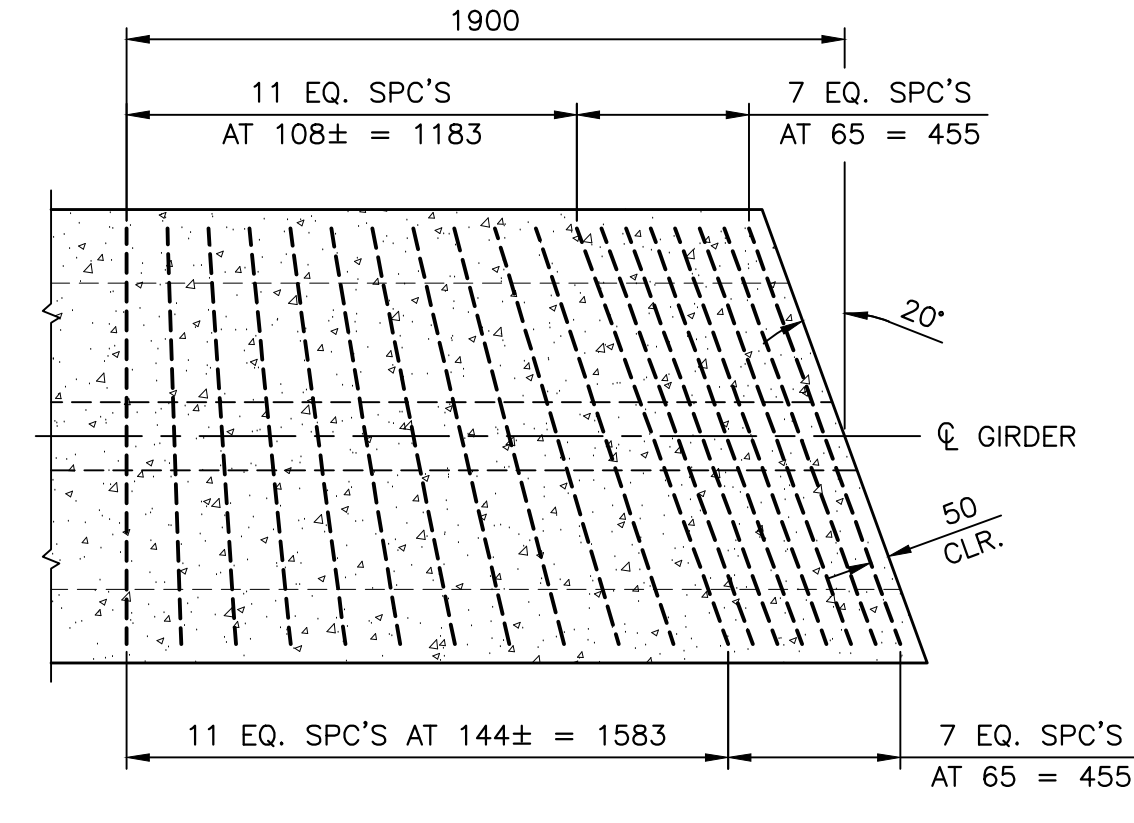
DETAIL - GIRDER STIRRUP REINFORCING (2) S7
